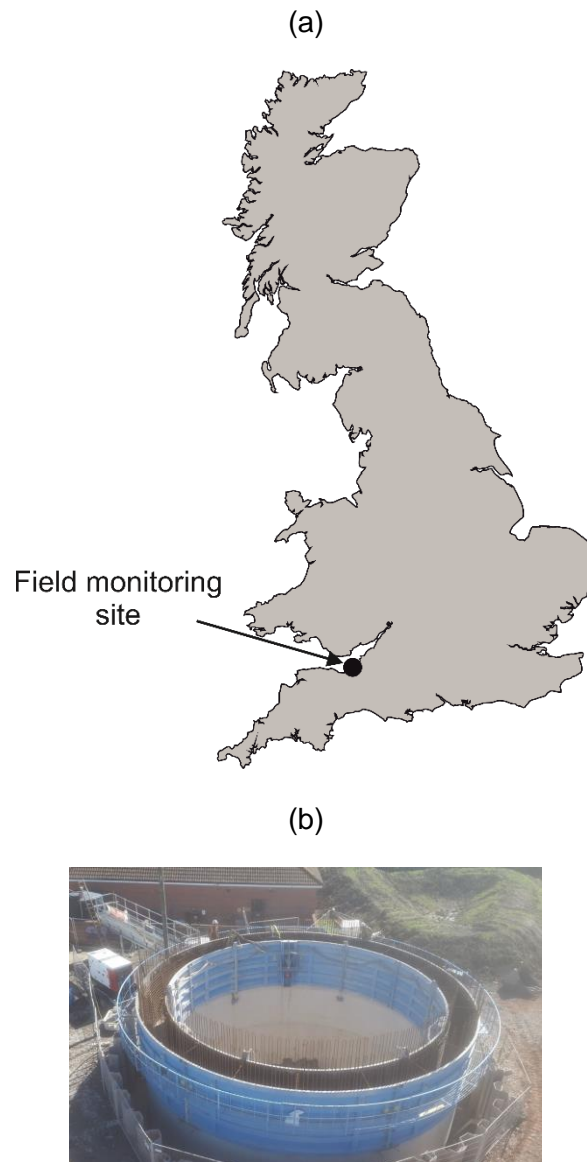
(a) Field monitoring site at Bridgewater, UK and (b) large-diameter reinforced concrete caisson under construction
